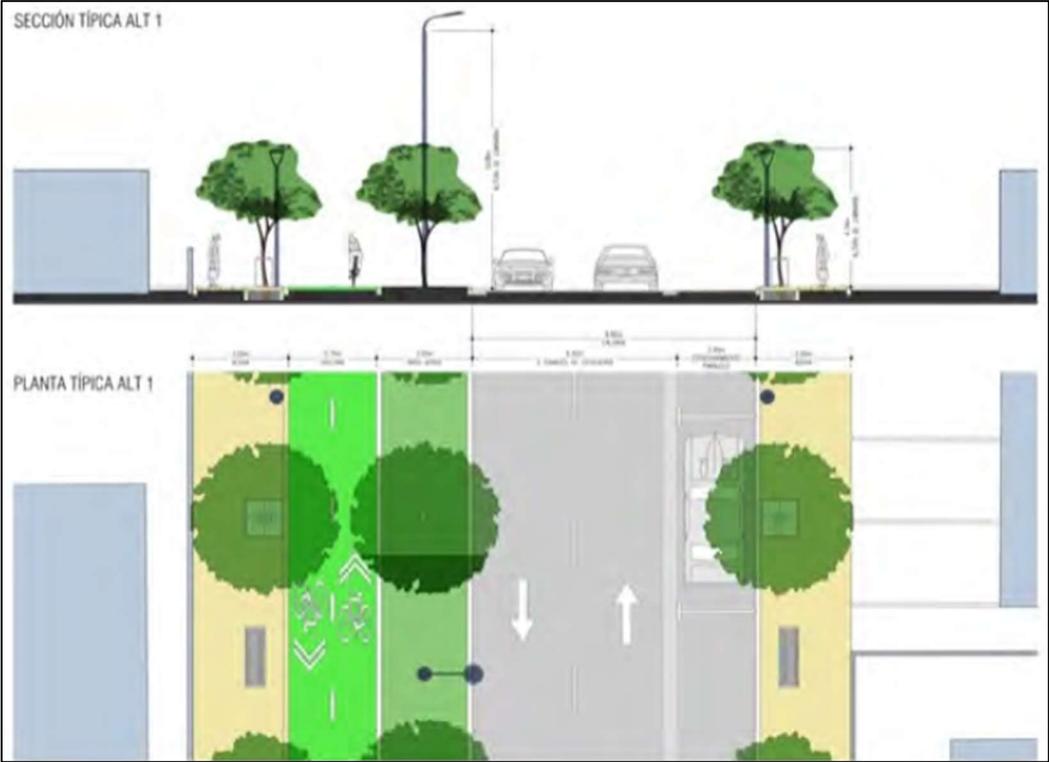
Detail of Street Section with Lamp Posts – ROSSILUGO ARCHITECTURE
